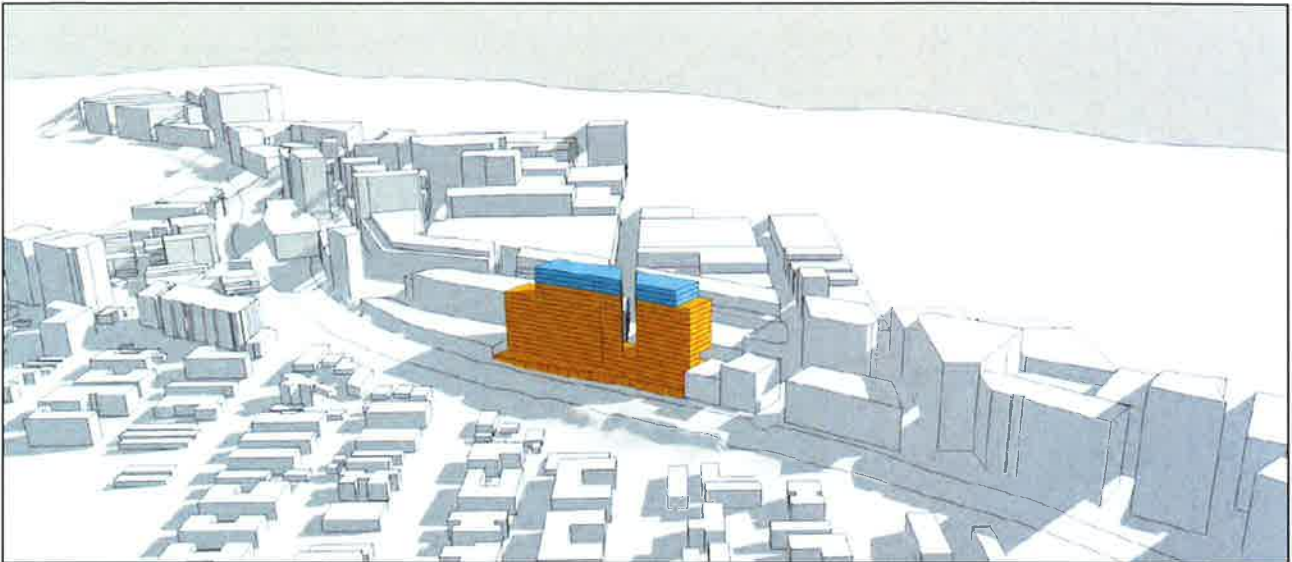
Perspective drawing of the proposal in context looking north (source: Proponent's EA)
